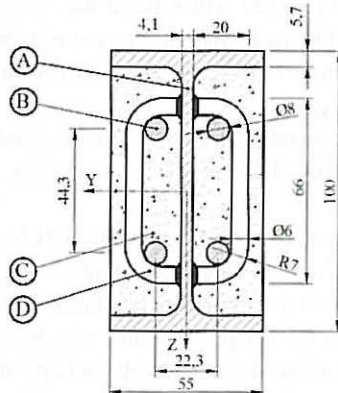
Cross section geometry (A-steel profile, B- longitudinal reinforcement, C- Concrete, D- Stirrups).
